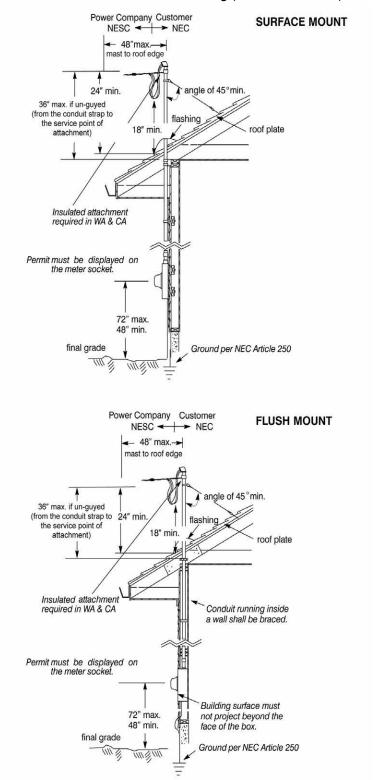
shows a typical installation of overhead service to surface and flush wall-mounted meters.
